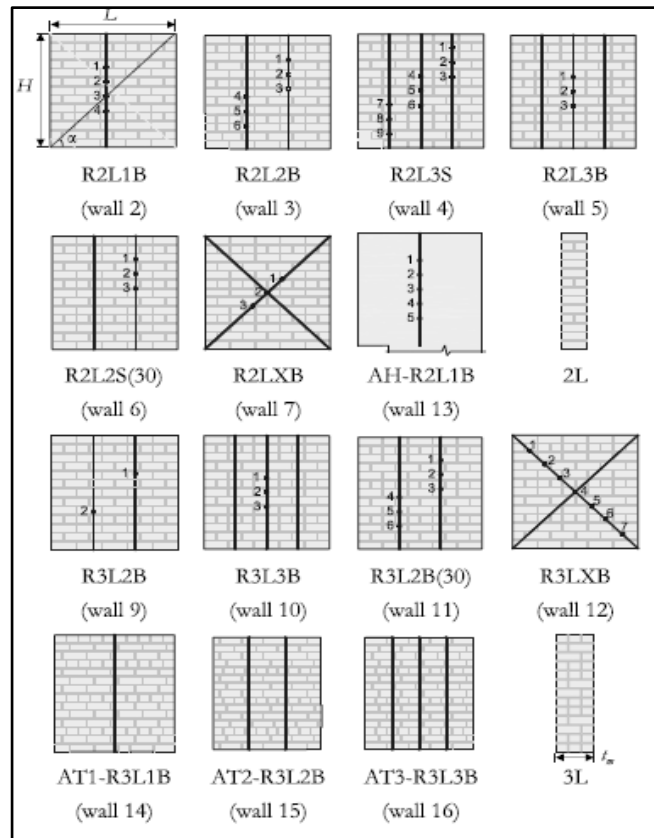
Wall panel retrofit details showing location of strains gauges [10]
